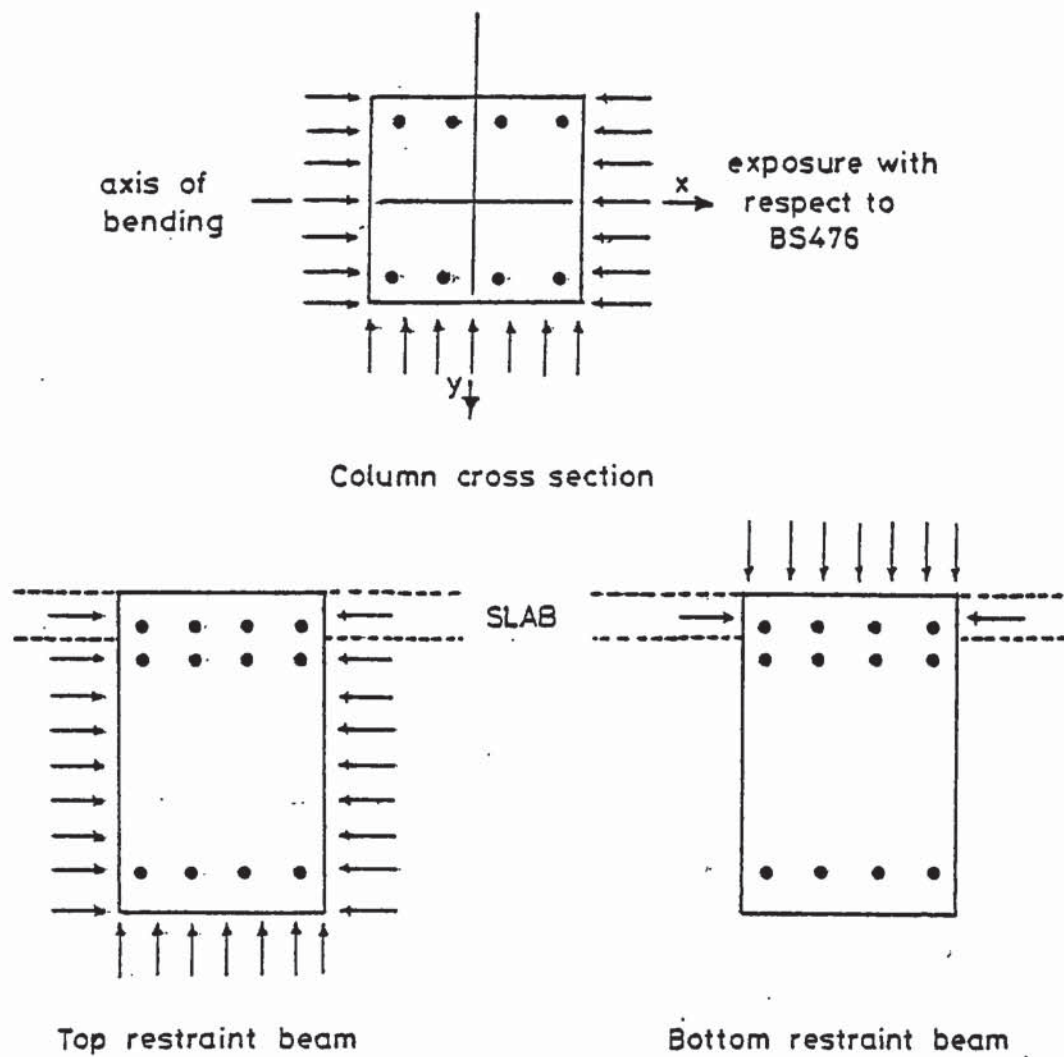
Diagram depicting exposure conditions for the cross sections of the structural system.
